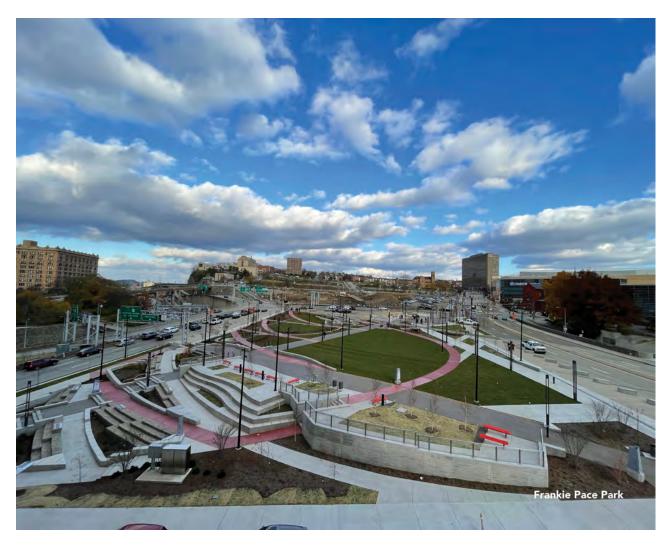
Aerial photo showing the constructed Frankie Mae Pace Park
